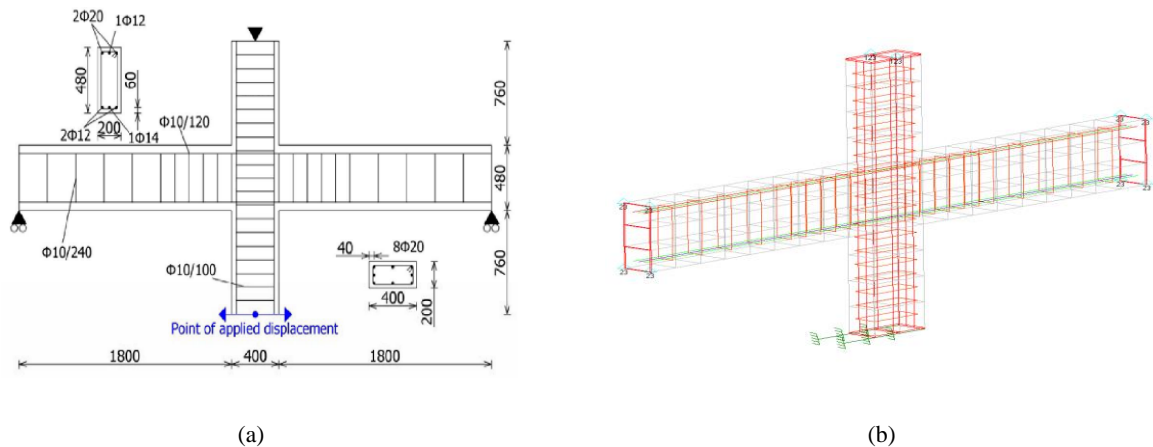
Interior frame joint. (a) Geometry and reinforcement details of the beam-column joint [38] and (b) 3D view of the FE mesh of concrete elements and steel reinforcement. [3]
